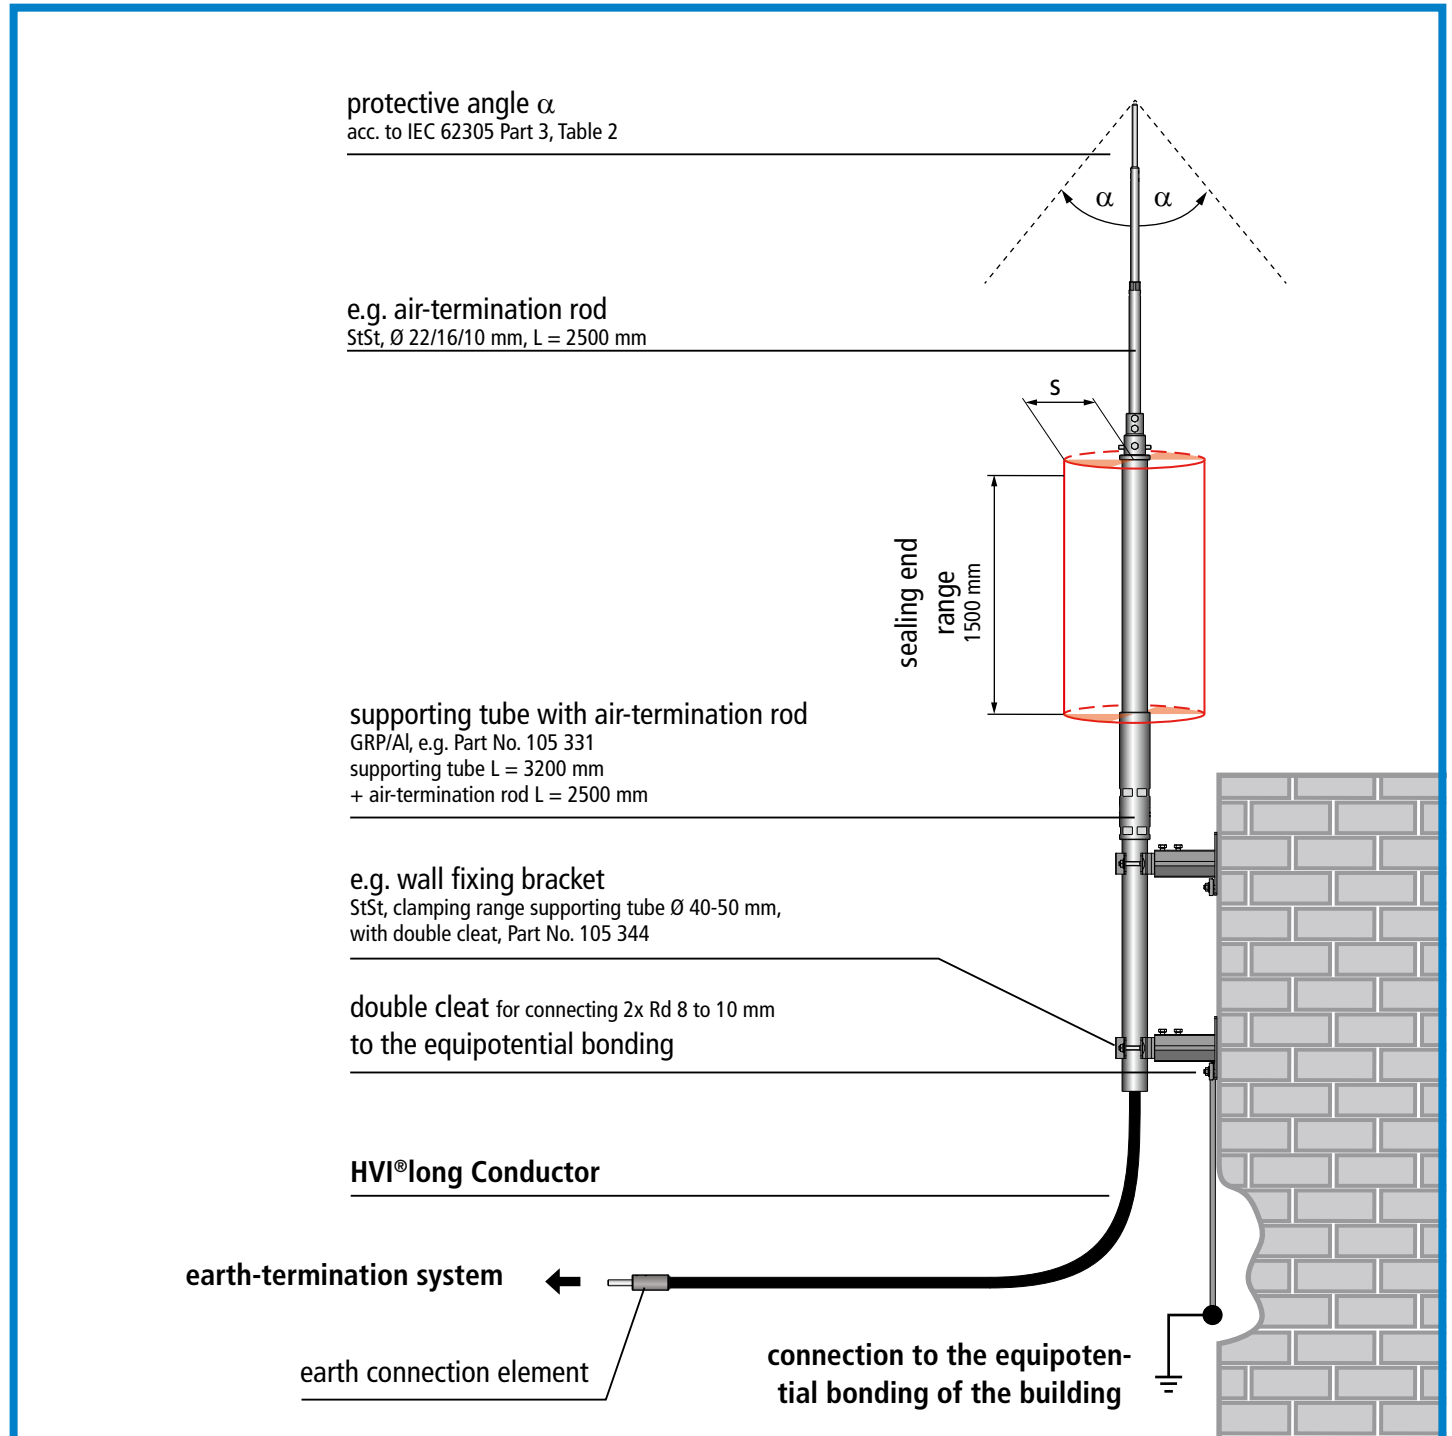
Isolated air-termination system with HVI®long Conductor and wall fixing bracket
